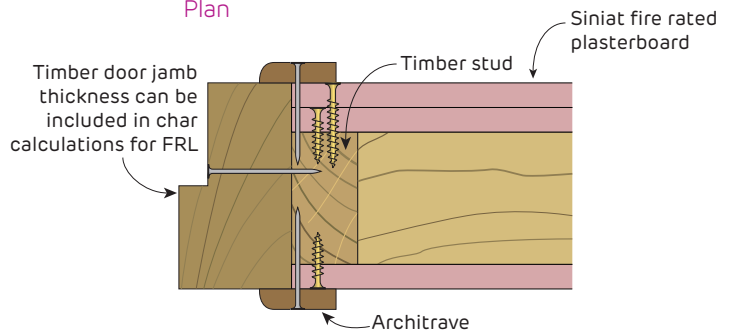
Typical Fire Rated Door Jamb Example only Plan
